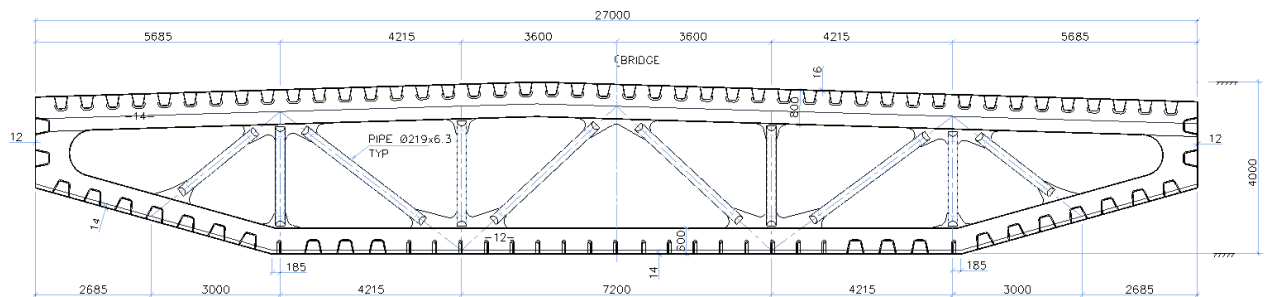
Typical transverse truss from axis 9, column width of 7200 mm
